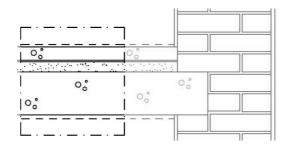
Structural section of a concrete intermediate floor in a solid masonry building. The loadbearing material is a solid in-situ concrete slab (approx. 200 mm). Above this, there may be levelling sand (approx. 30-50 mm) and concrete slab (approx. 50-80 mm). This structure is typical of the 1950s and 1960s. If the external wall is concrete, the intermediate floor may also be a prefabricated solid concrete element (Weijo et al. 2019).
